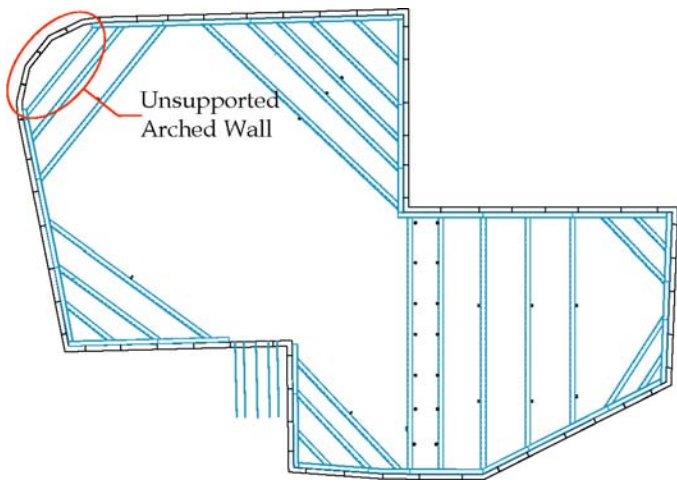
Bracing Layout at Level 1 (El.+8'-0")
